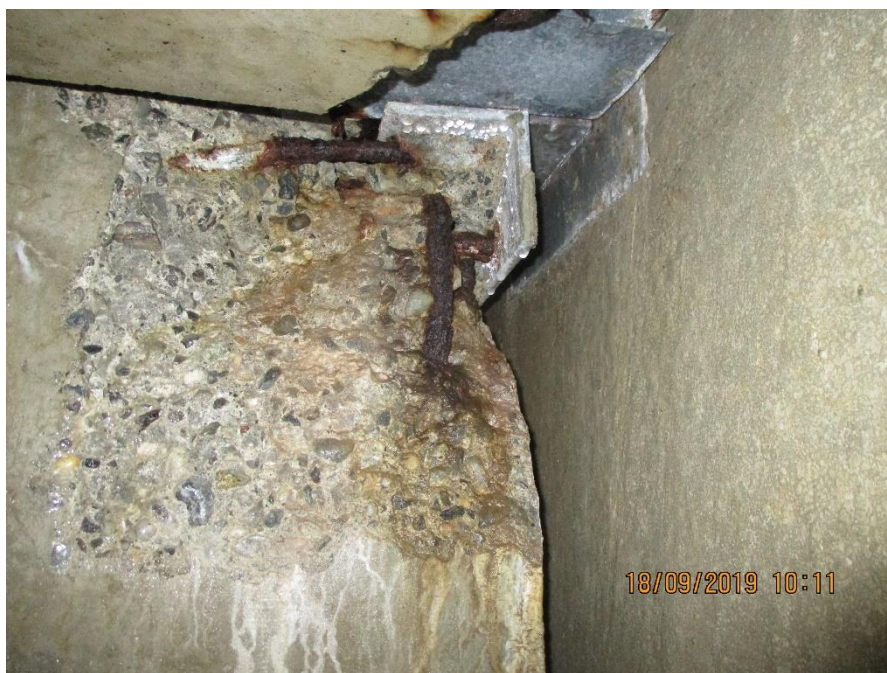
Spalling at top of girder and exposed reinforcing steel (typical condition)
